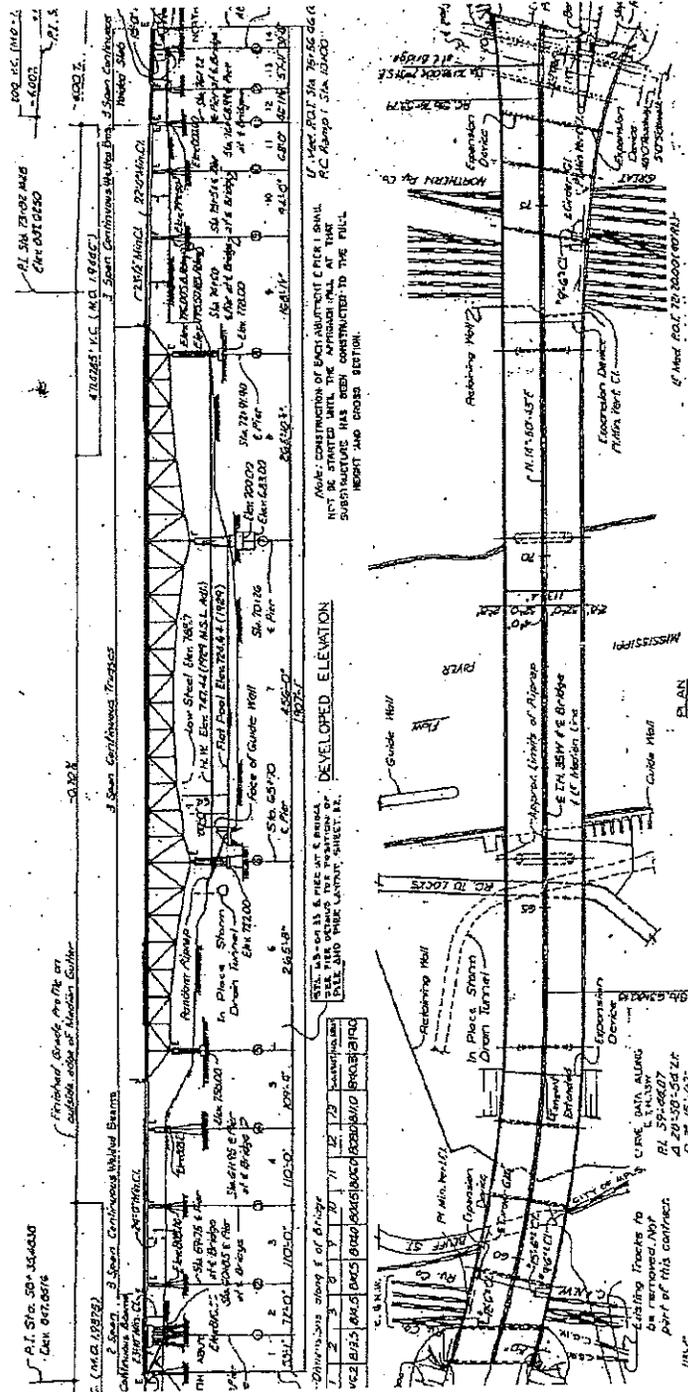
Bridge 9340 General Plan and Elevation from Original Contract Plans
